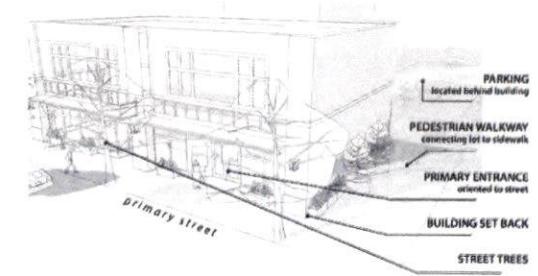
The diagram above illustrates the ideal placement of residential buildings to maximize the lot while addressing the street.
